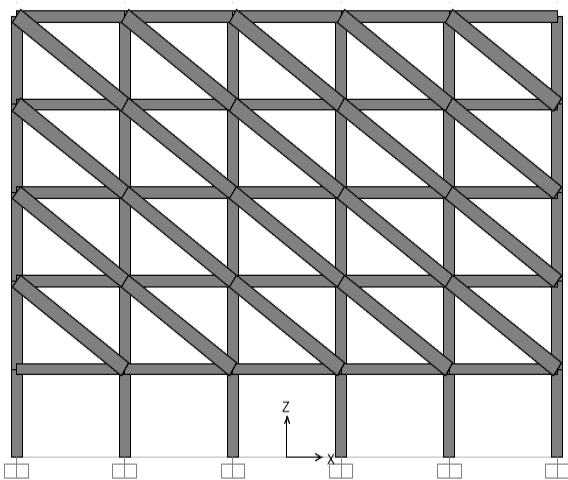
Elevation of the five storeyed building models with openings (10% to 30%)
